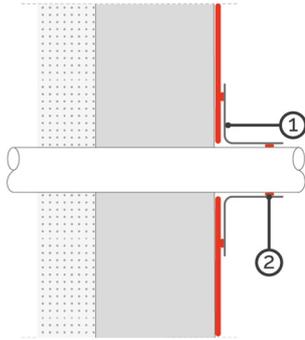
Sealing of encounter with drainage pipe. (1) Prefabricated piece (2) Rn proof sealant, [13].
